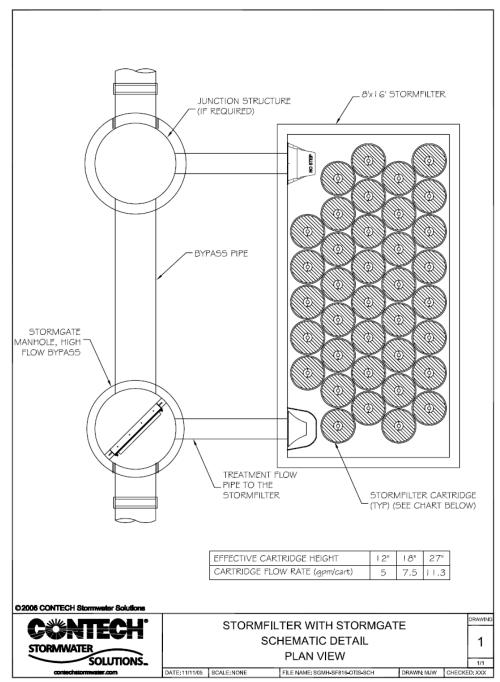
Stormwater Management StormFilter Configuration with Bypass
